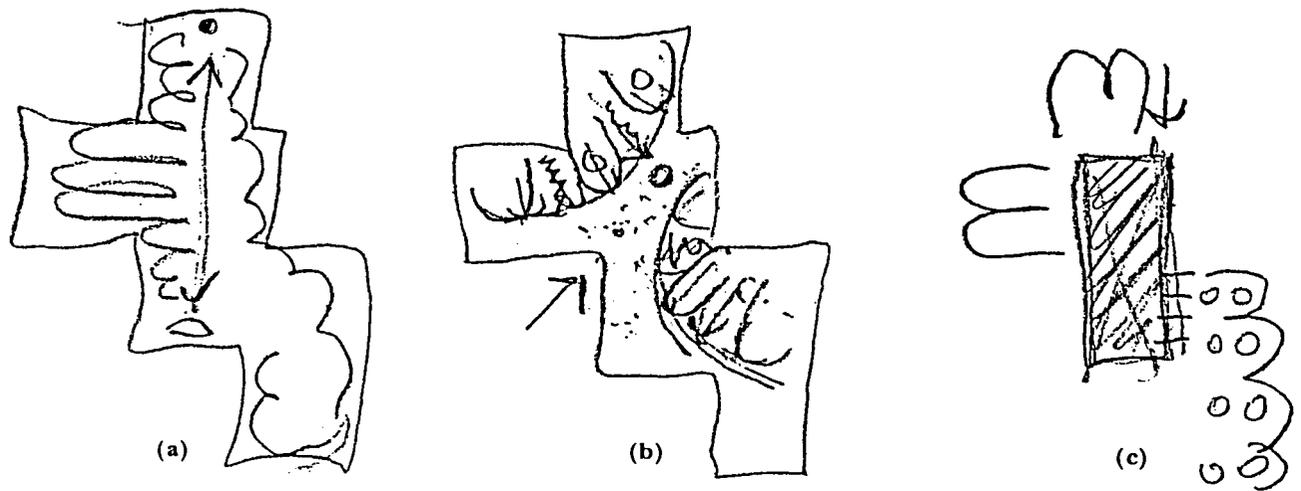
Alternative Library Plans Using Different Entry Points: (a). Long Entry Hall Between Reading Rooms and Stacks, (b). Open Plan With Interior Court, and (c). Library Elements Surrounding Atrium
